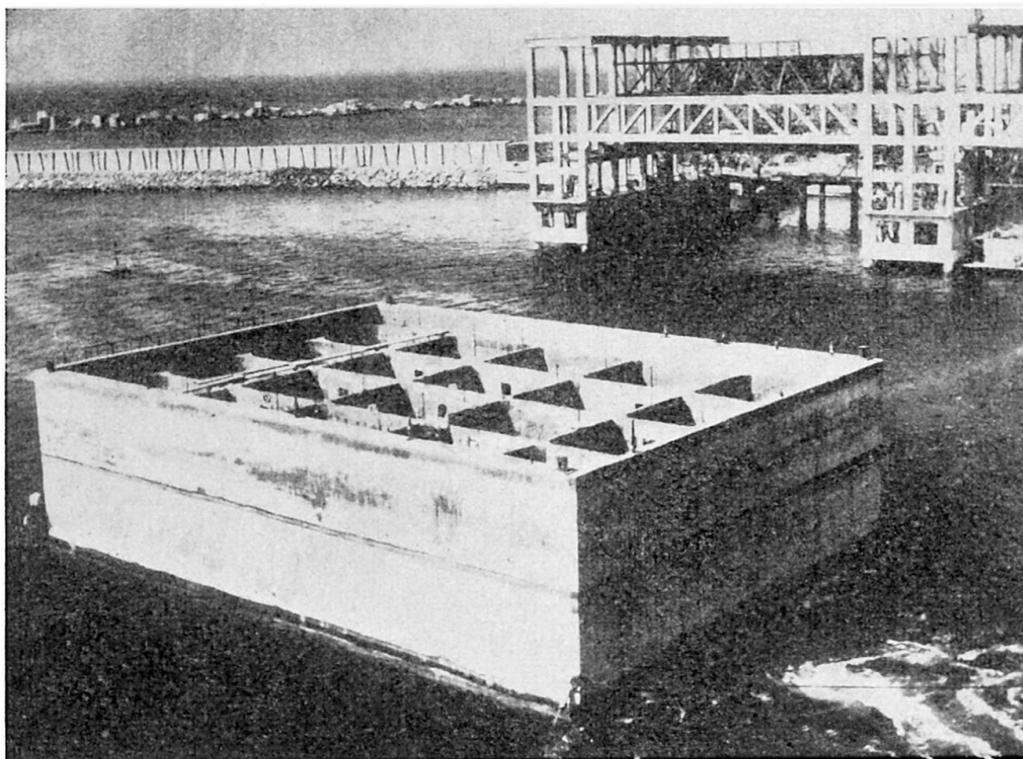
Airport dam and pier at Genoa. Floating caissons and precasting equipment (Impresa Fincosit).
